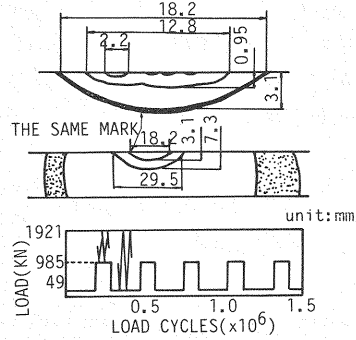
Beach Marks on the failure surface of HD-2 specimen.
